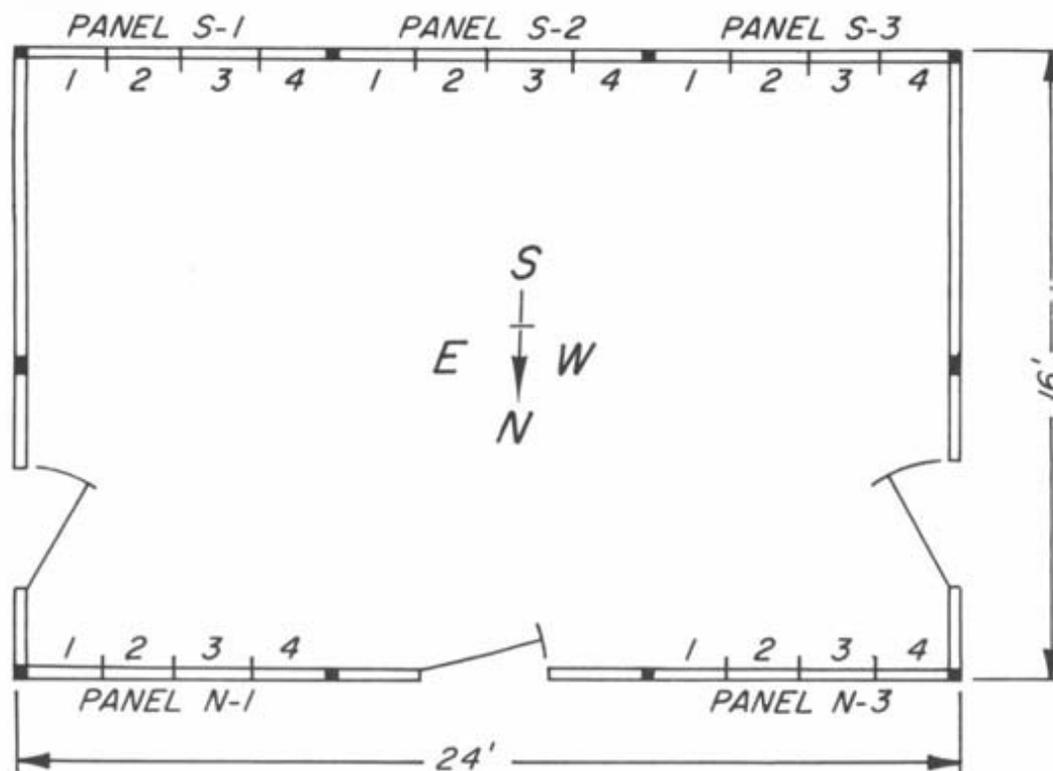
Arrangement of panels in FPL test house. (M 144897)
